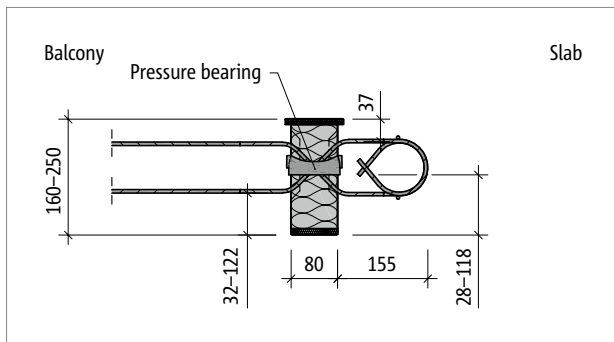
Schöck Isokorb® T type Q-T-W-VV1 to VV2: product section
